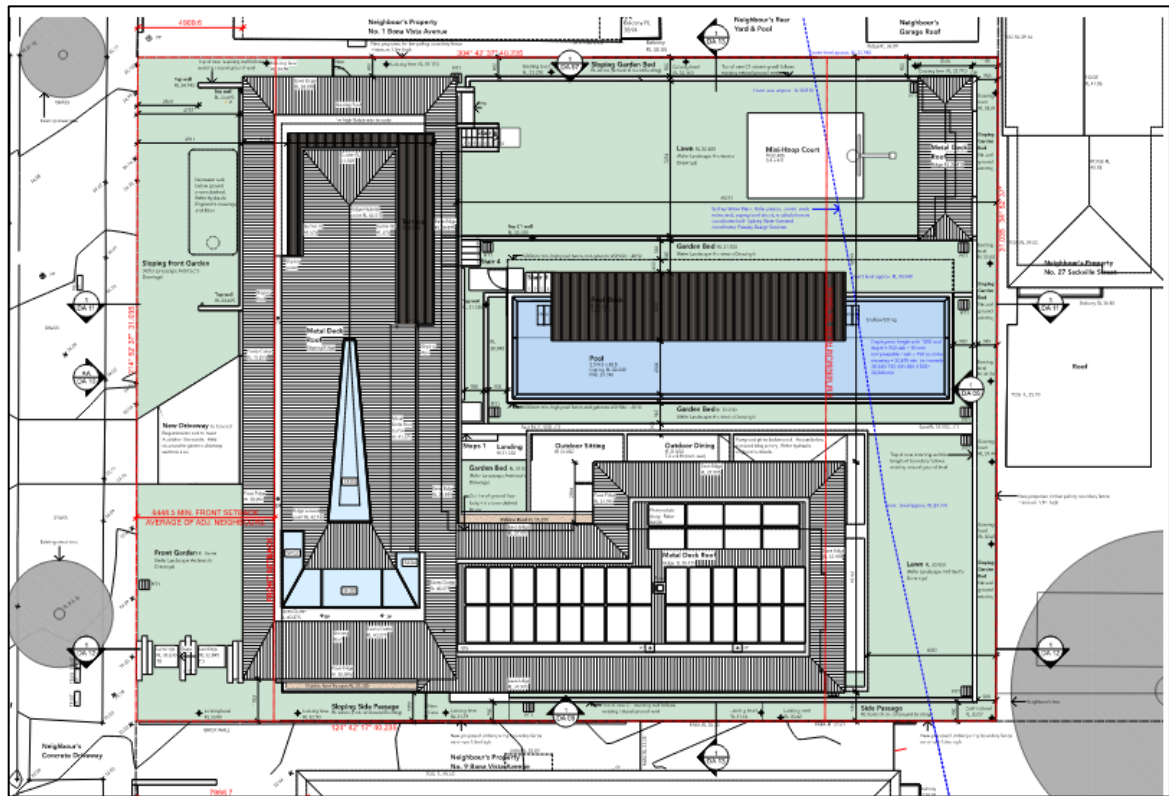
Original Proposal - Roof Plan at subject site (Source: Dominic Levene)
